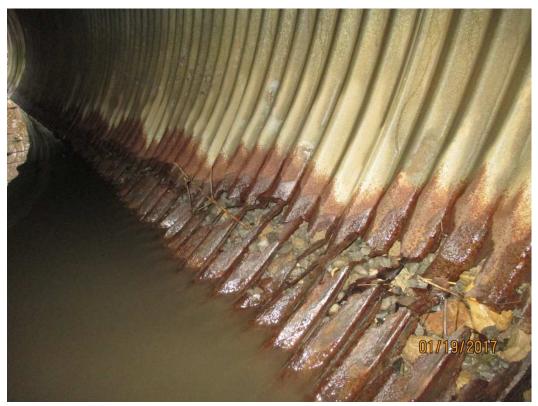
Corrosion with Critical Perforations & Section Loss - East Side of Section 4 of East Culvert Pipe
